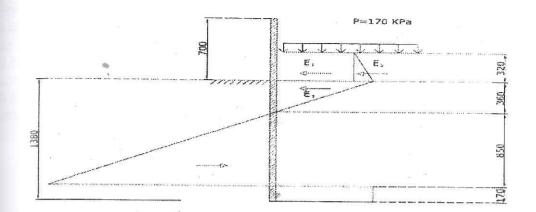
Sheet pile walls and earth pressure diagrams E_i =308KN/m E_2 =55KN/m, E_3 = 205KN/m
